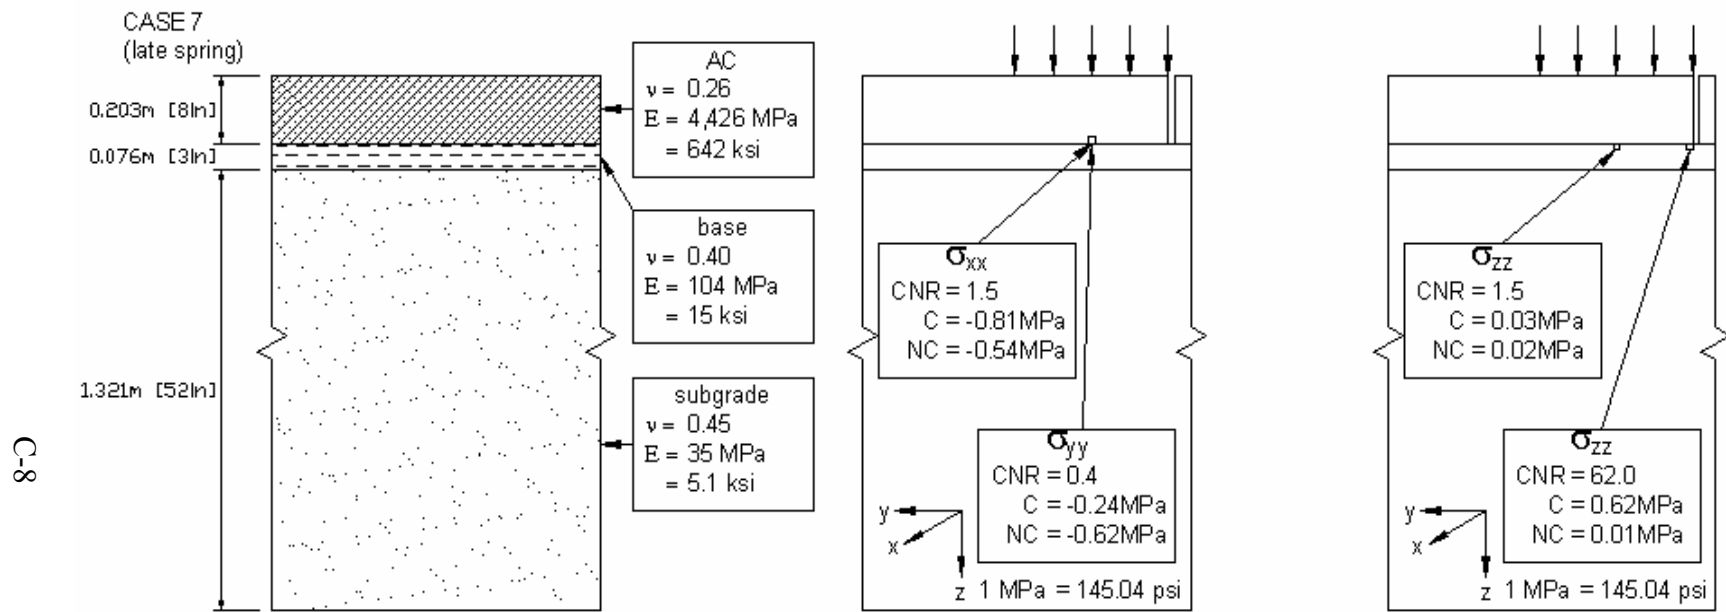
Summary cross section for case 7, (C – stress in cracked pavement, NC – stress in pavement with no crack, CNR – crack/no crack (stress) ratio)
